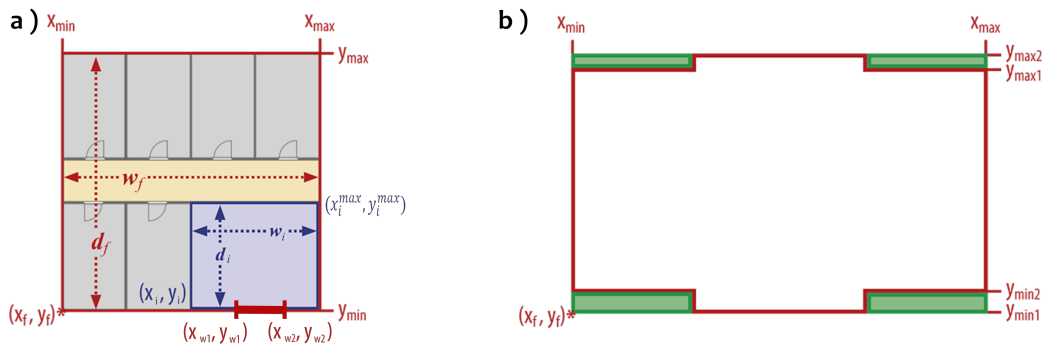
a) Overview of location and shape parameters for modeling floorplans b) Handling non-rectangular footprints by adding additional auxiliary rooms (green)
